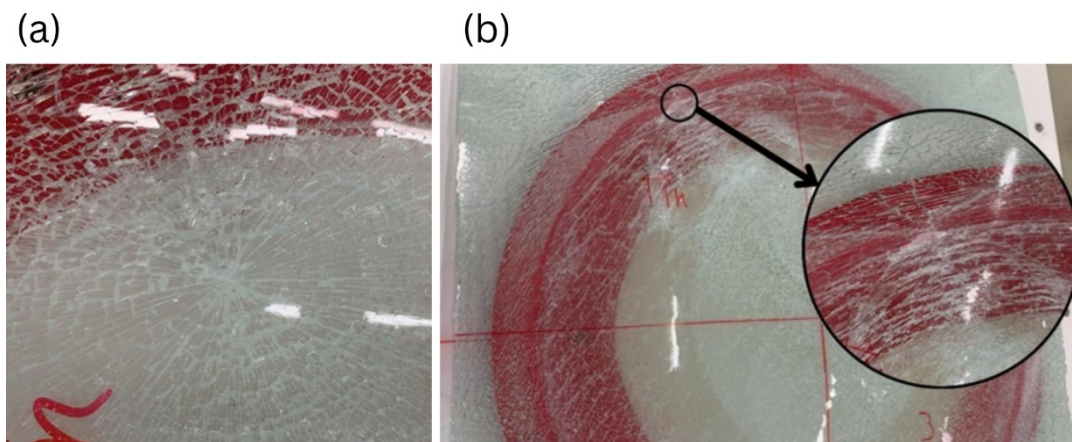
Fracture pattern of glass: (a) radial fracture pattern; (b) fracture pattern associated with ring failures.
